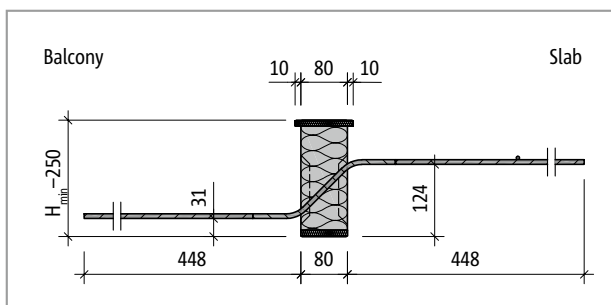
Schöck Isokorb® T type Q-Z-V6: Product section
